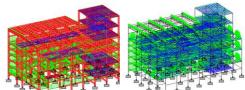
Isometric view and 3D view of the building 3.5.1 Equipment operating load
